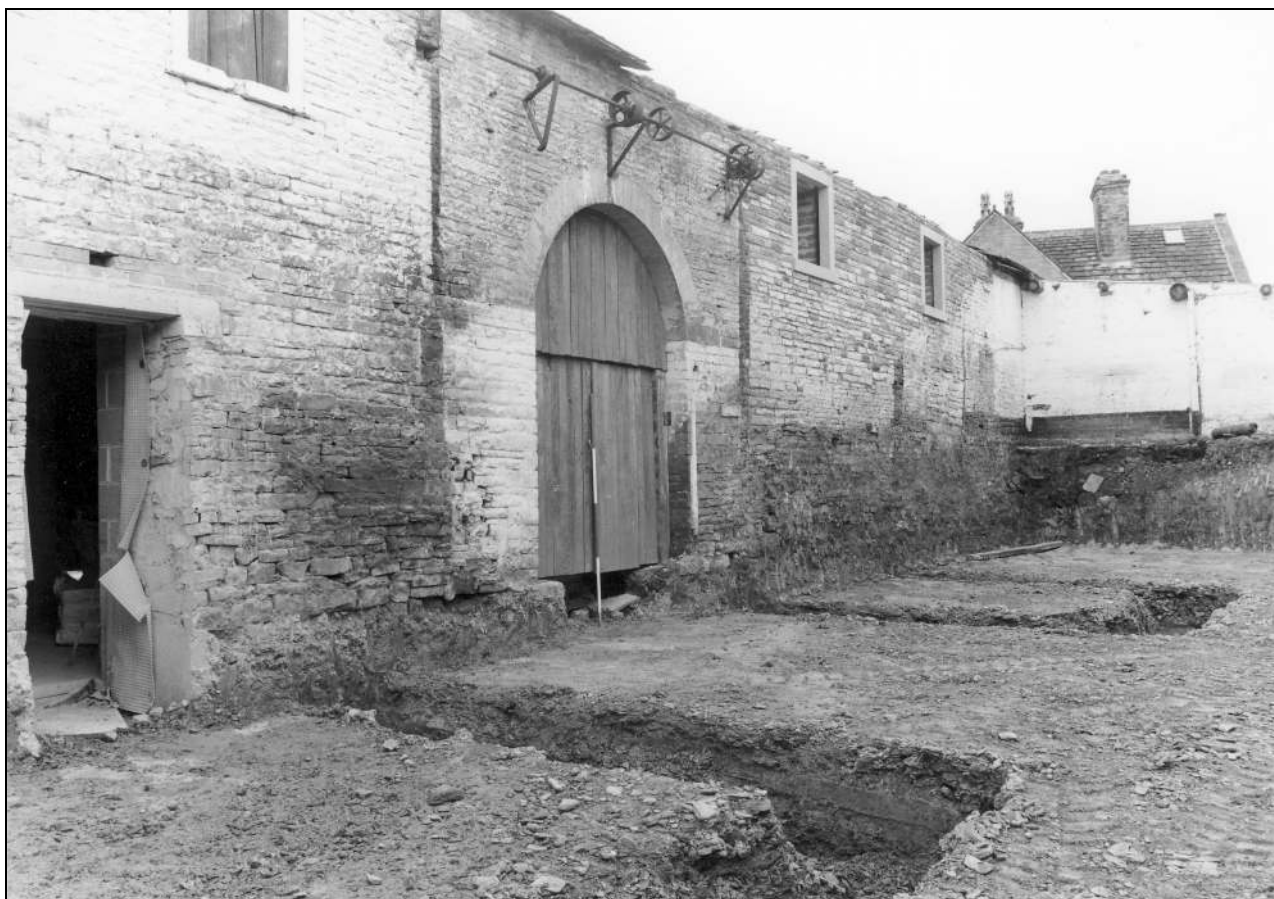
East elevation of barn, after demolition of lean-tos in 2014 (film 8, frame 2)
